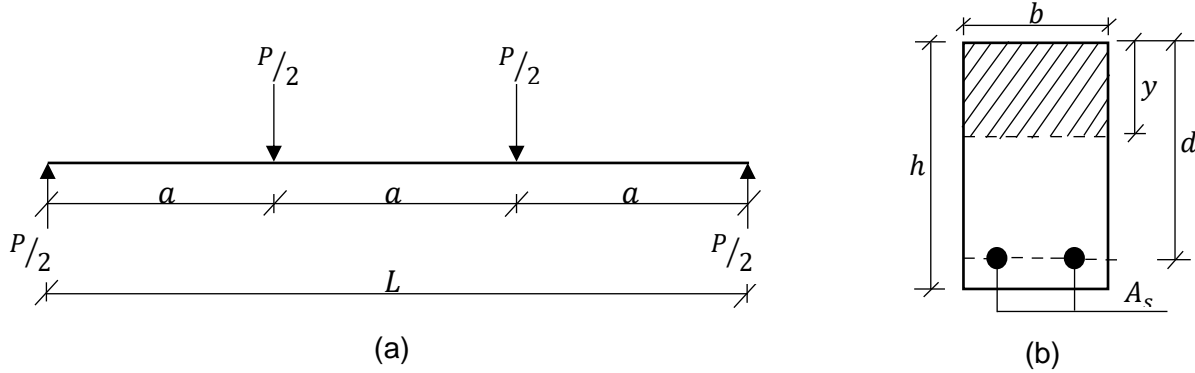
Idealised equipment set-up for the four-point loaded beam and the central cross section of the reinforced beam.
